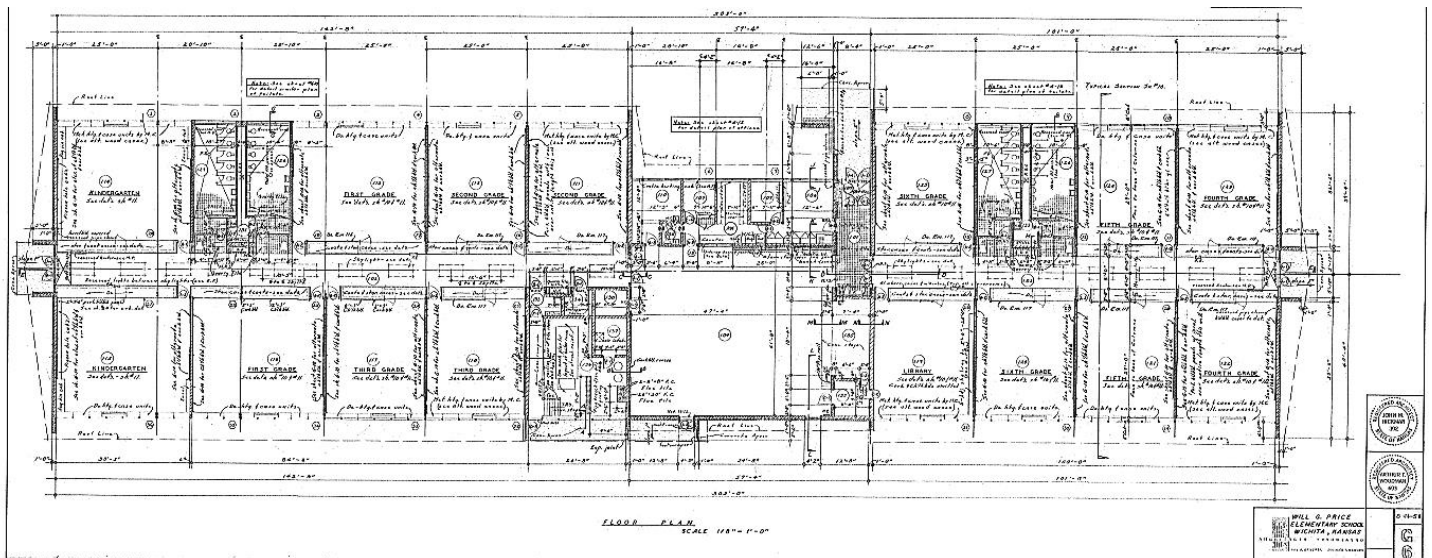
Floor Plan, Sheet G-6. Original design documents by Architects Associated (Hickman & Woodward), 8-14-1956, Provided by Wichita Public Schools.
